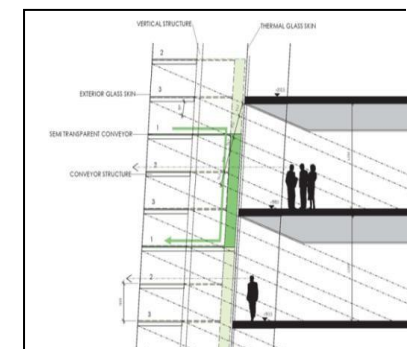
Planta Wall Source : <http://plantagon.com/>
